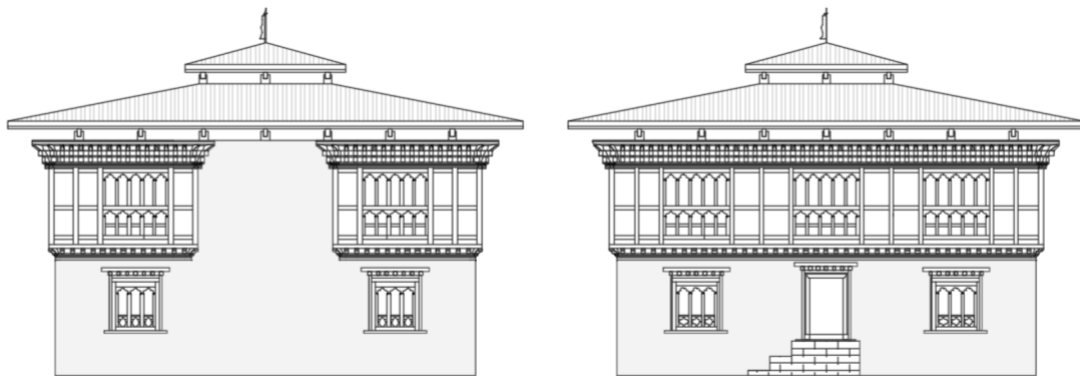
Sub-type 2-two-storied house- Left: side elevation; Right: Front Elevation (Drawing by author)
